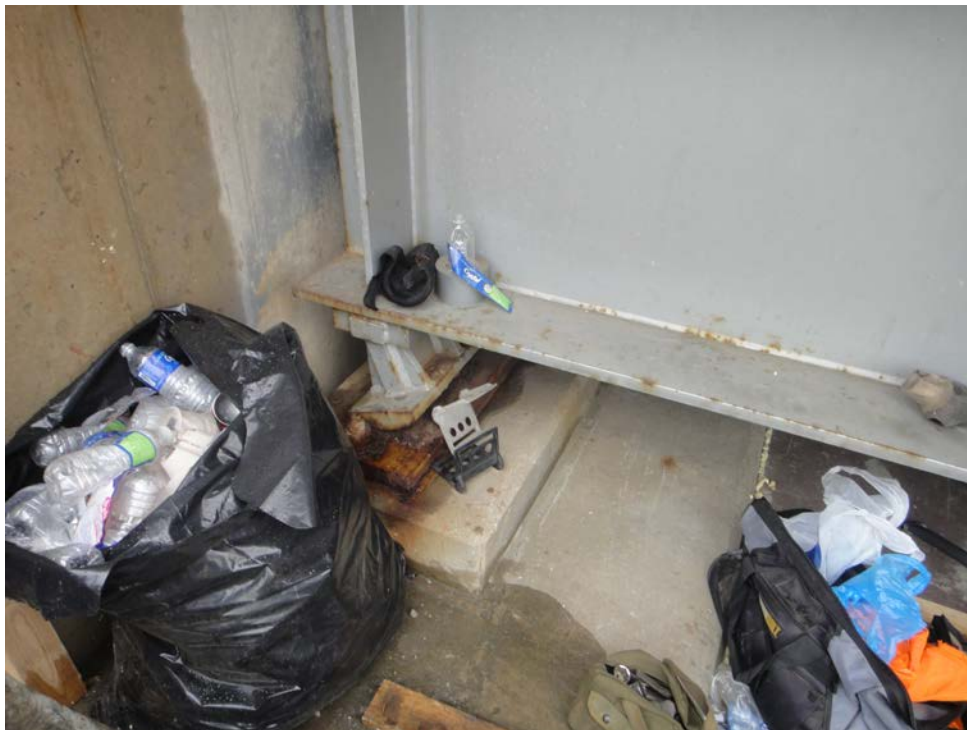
Debris Accumulated on and Near a Bridge Abutment
